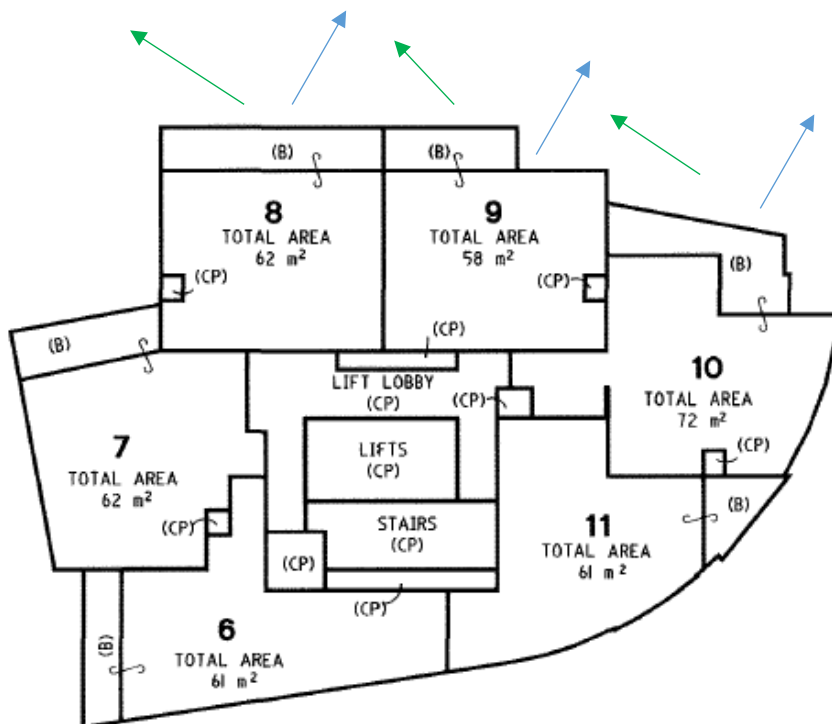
Strata Plan layout (typical) of Level 3-8, at 417-419 Bourke Street, Surry Hills
